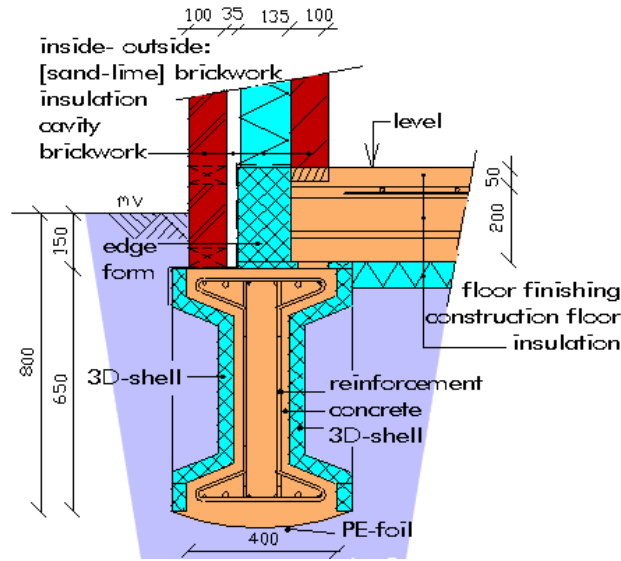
Cross-section of a foundation supporting brickwork wall and floor.
